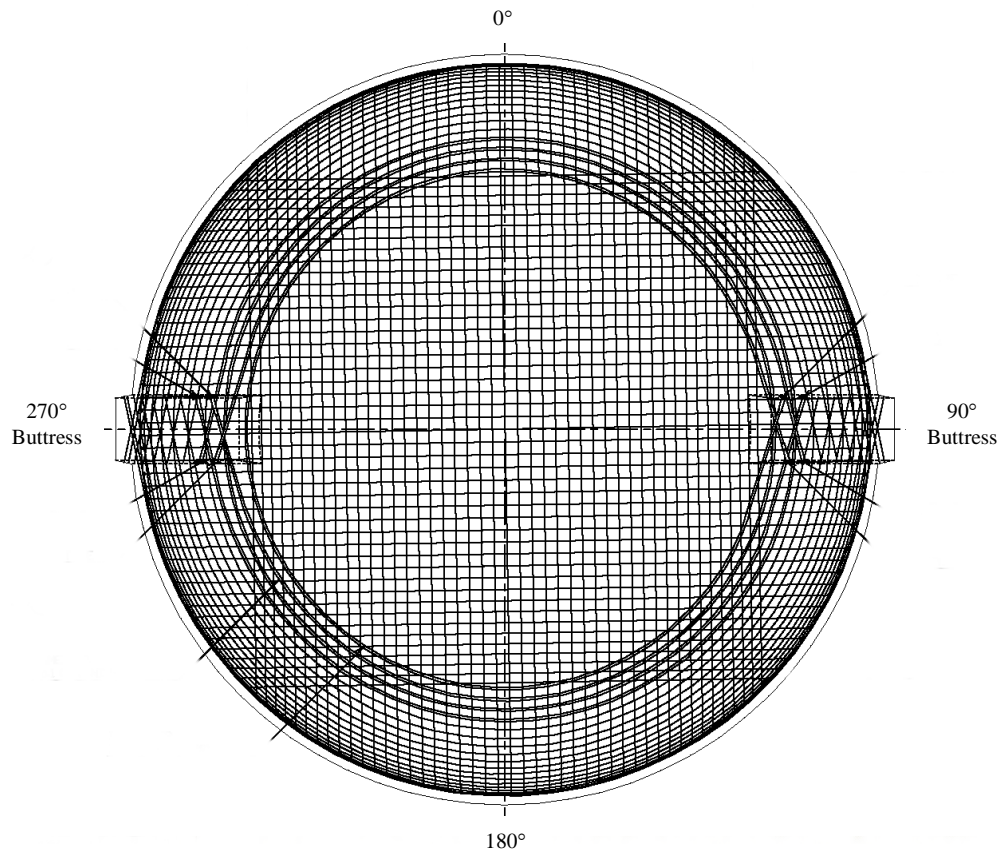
Prestressing tendon arrangement, dome (plan view from above) [3].
